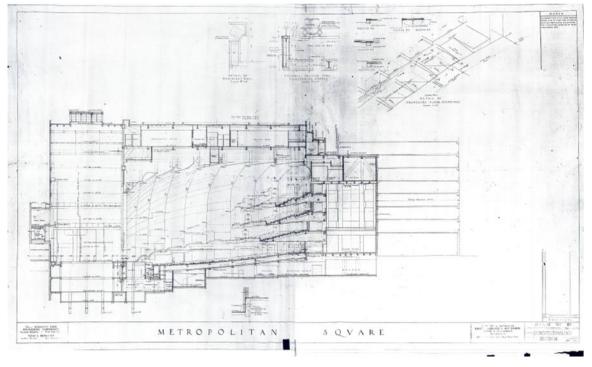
, elevation for the hydraulic system and the lighting system that still exists today.
